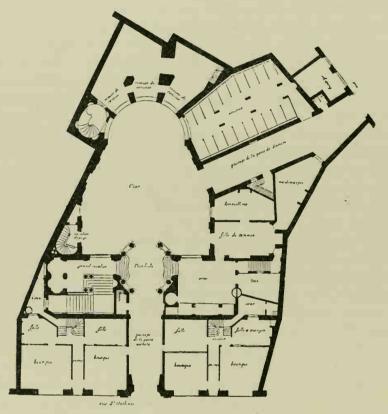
Antoine Le Pautre: Hôtel de Beauvais: Plan of ground floor
